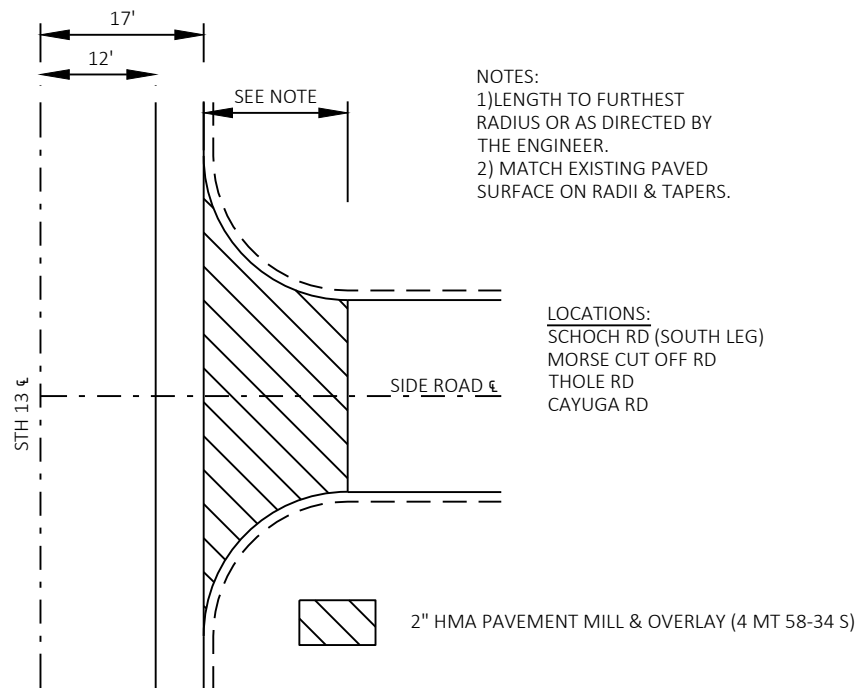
DETAIL OF PAVED SIDE ROAD WITH CURB & GUTTER
